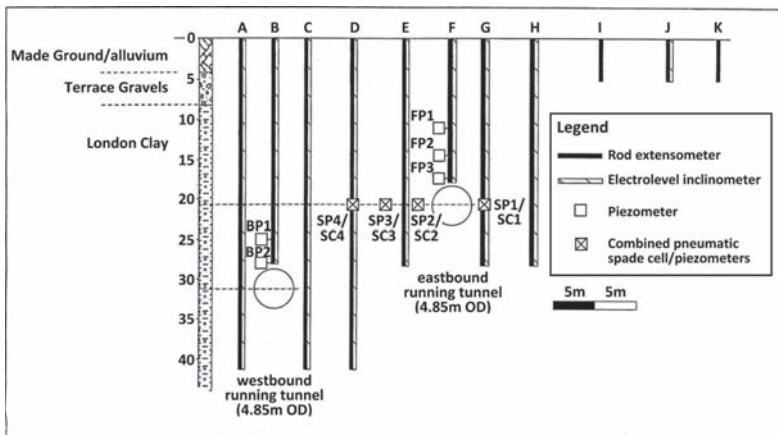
Elevation of instrumentation layout at St James's Park (after Nyren, 1998).
